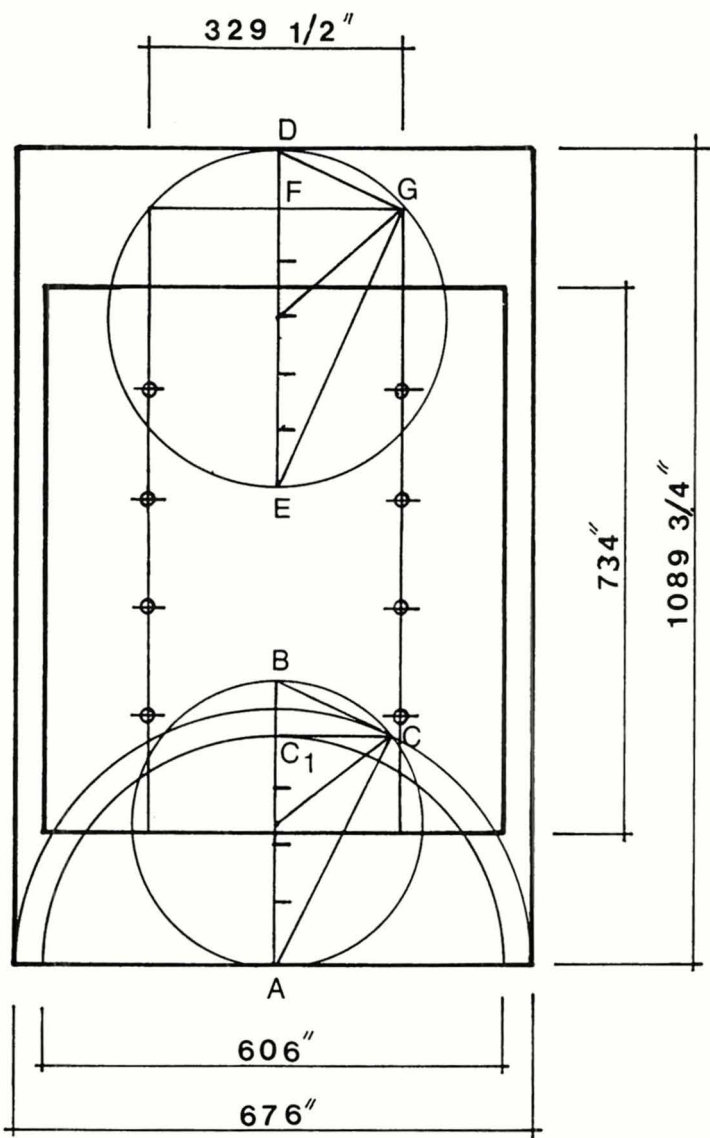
Geometry of the Interior Space, Vere Street Church, London
